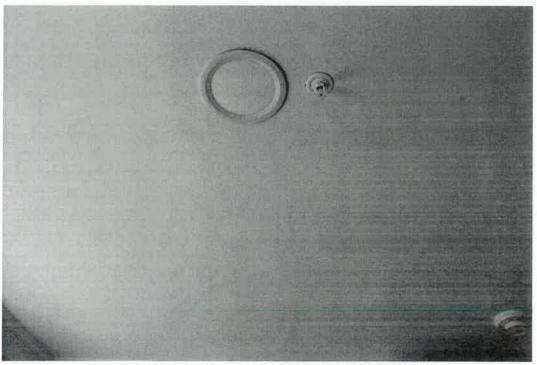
Sheet rock ceiling in second floor northernmost unit
